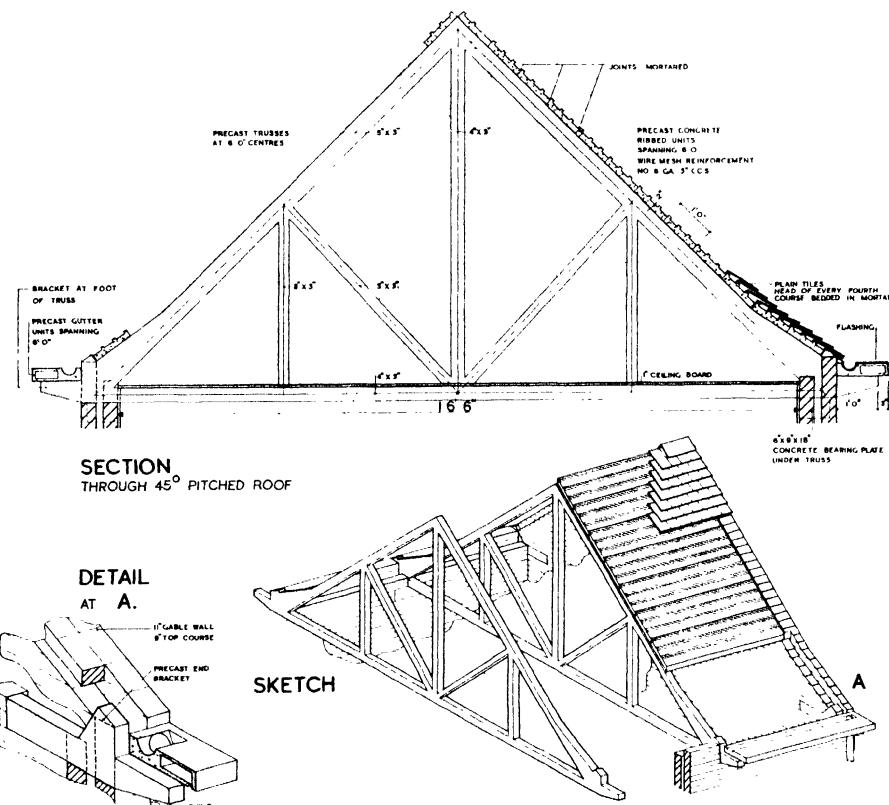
EXAMPLE OF CONCRETE CONSTRUCTION FOR PITCHED ROOF, USING PRECAST TRUSSES (Cement & Concrete Association)
